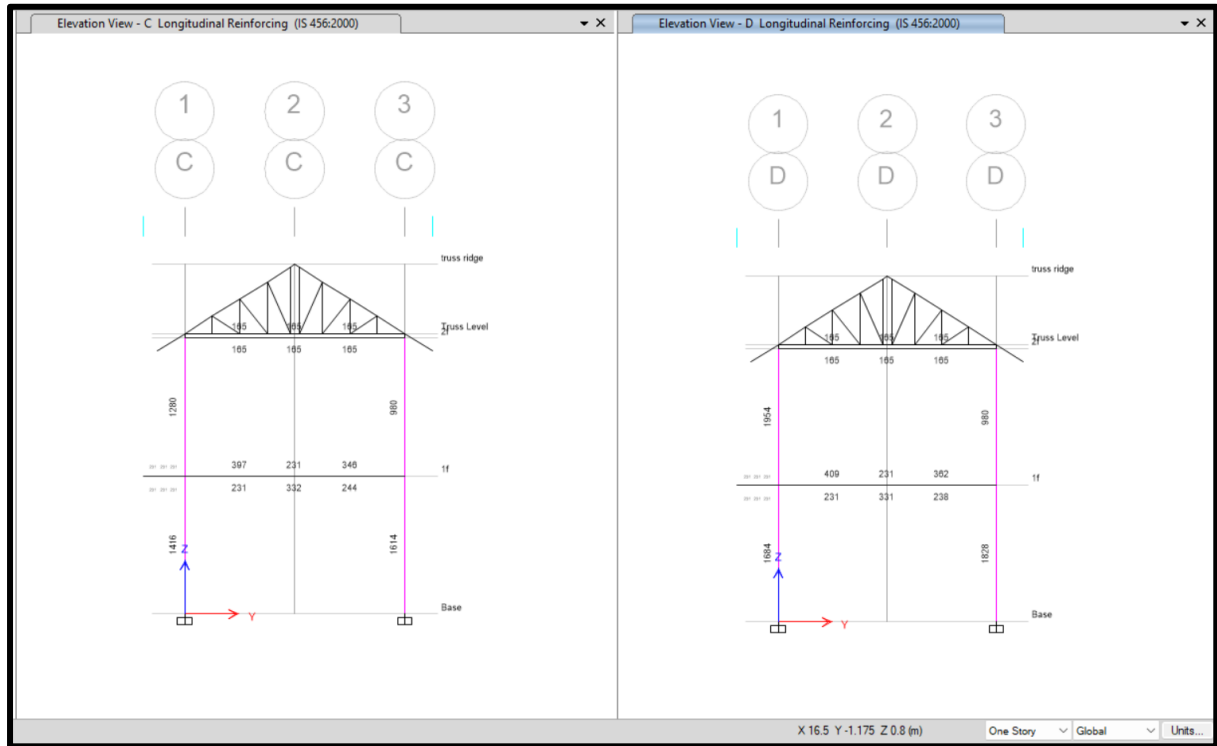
Typical longitudinal reinforcement of column in Grid C & D
